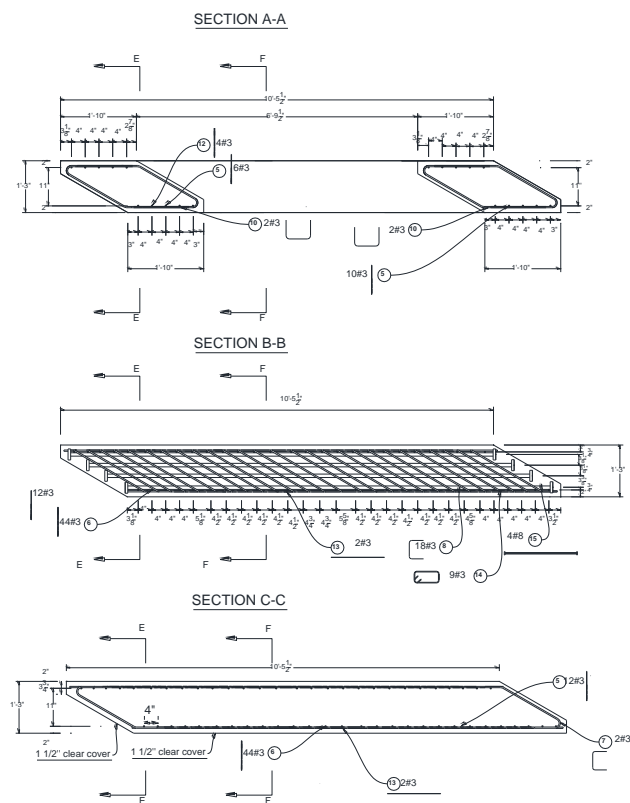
Section A-A, B-B and C-C in design drawings for Specimen 12 (see Figure 8.2 for the location of the sections)
